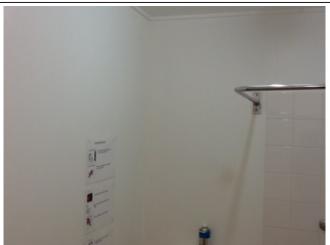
NT0554-332 Result: Asbestos - Positive Building/Level: Main Building - Anglicare-Ground Level Room/Location: Female Toilets-North & West Feature/Material: Wall Lining-Insulating Board
